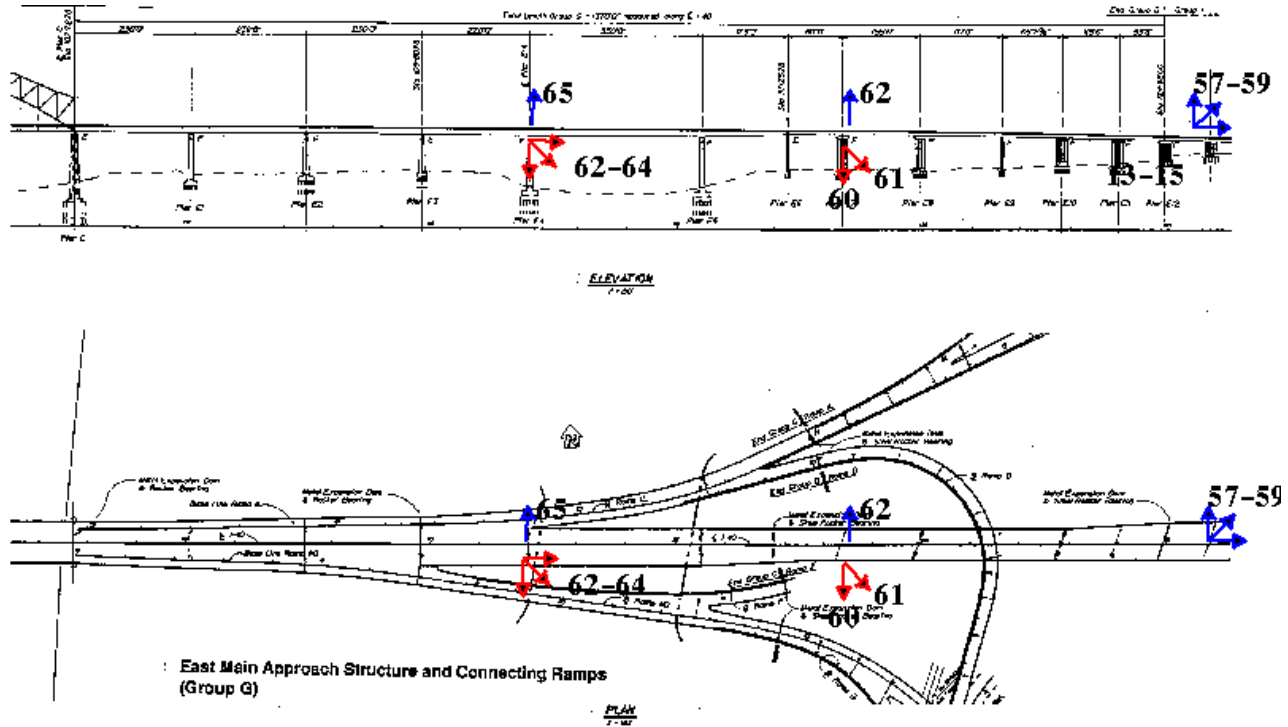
East Approach to the I-40 Bridge and Sensor Locations.
